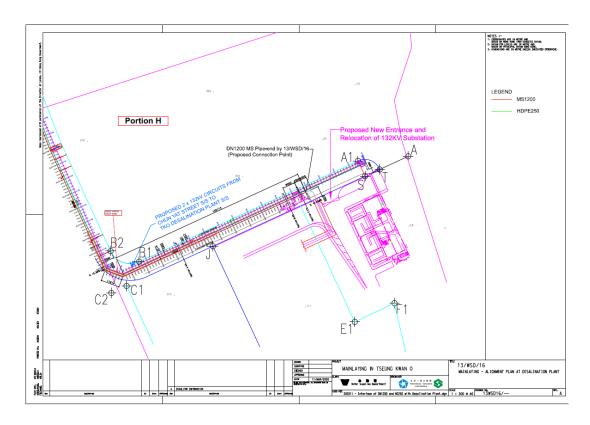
Location Plan for CH.CT 0+07 – 2+58
